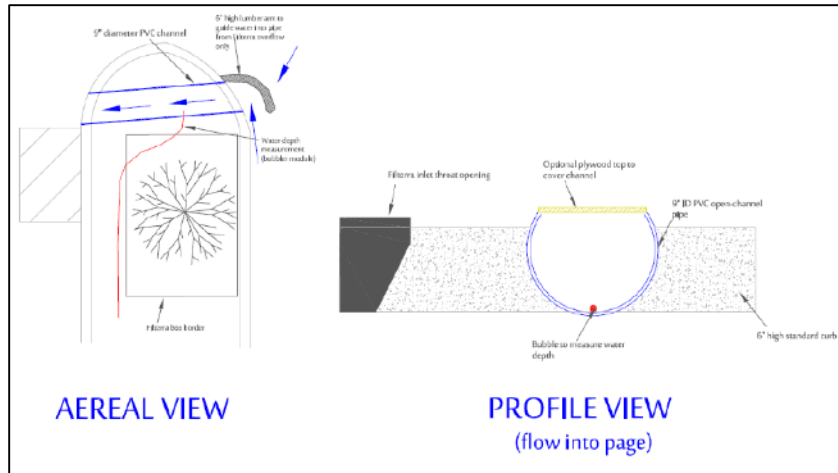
Plan and cross section of the overflow pipe for bypass monitoring
